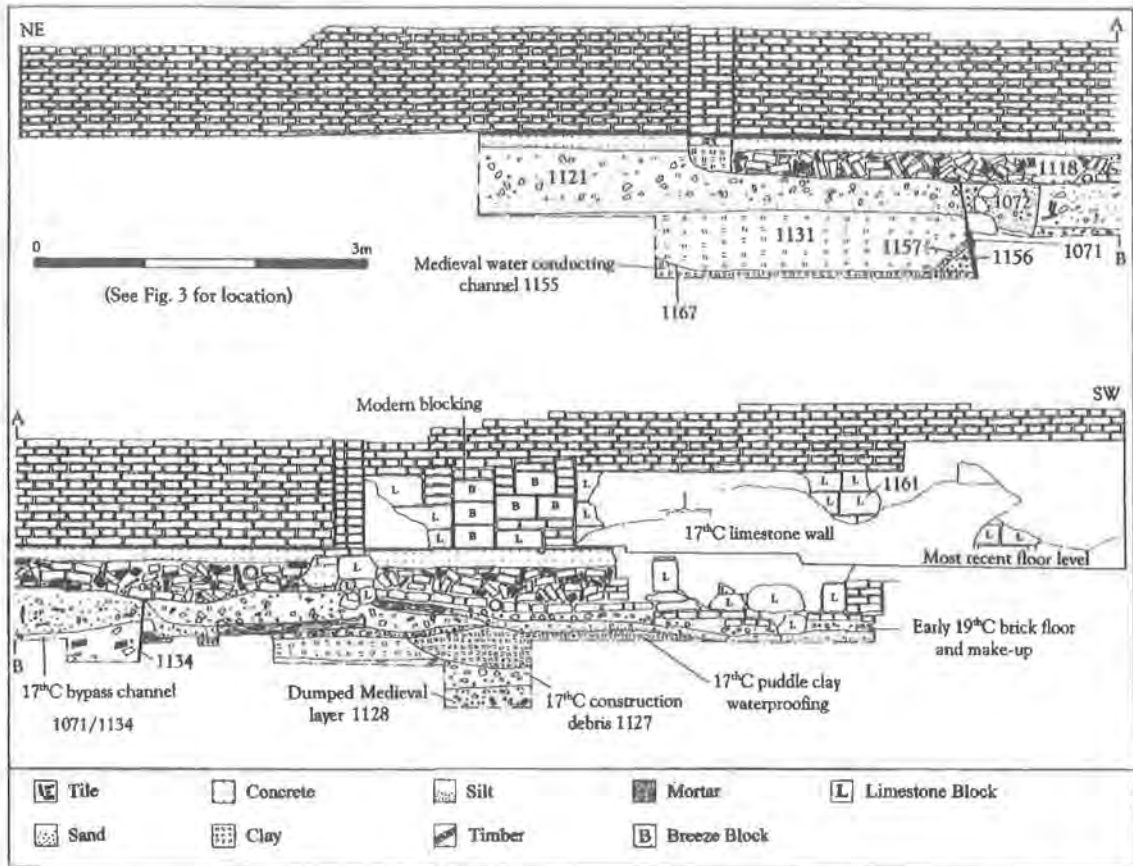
NE-SW section showing mill walls, floors and features to the north east of the mill wheel-pit (see Figure 3 for location).
